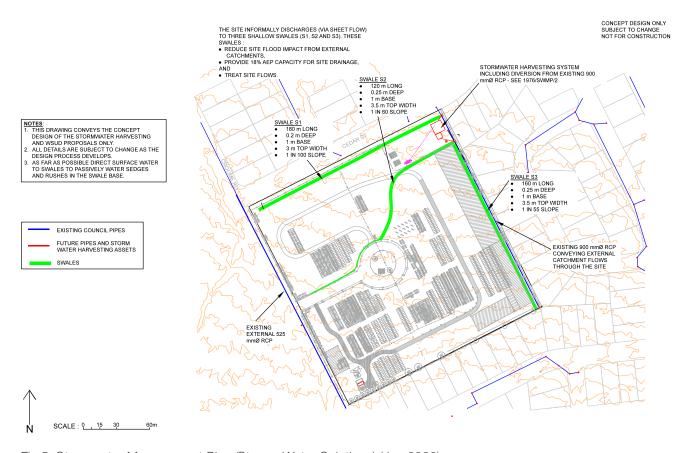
Stormwater Management Plan (Stormy Water Solutions) (Jan 2020)
